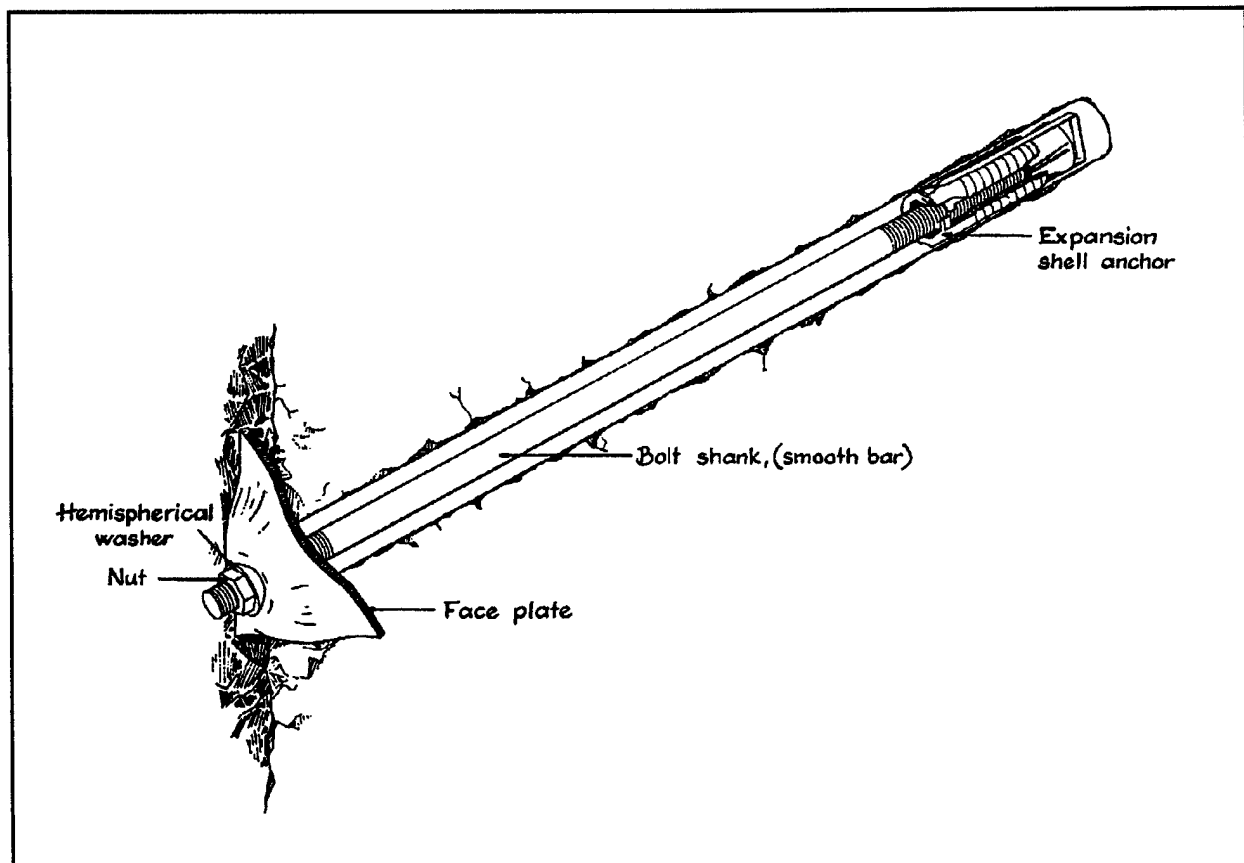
Mechanically anchored rock bolt—expansion shell anchor
